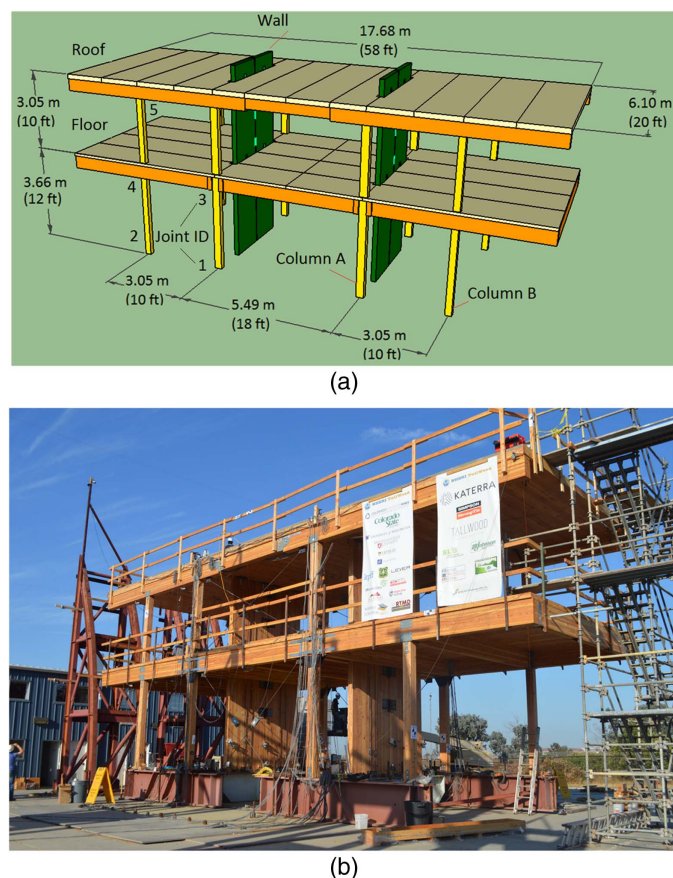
Test building configuration: (a) solid model and dimensions; and (b) photo of the constructed building.
